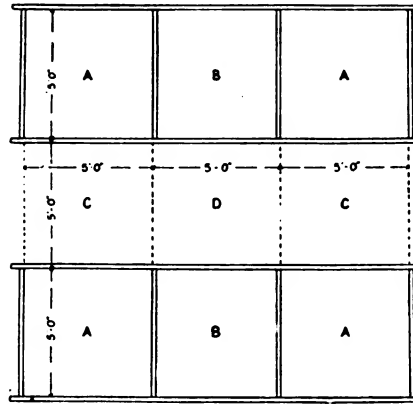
TO AVOID CRACKING THE FLOOR IS DIVIDED INTO BLOCKS
